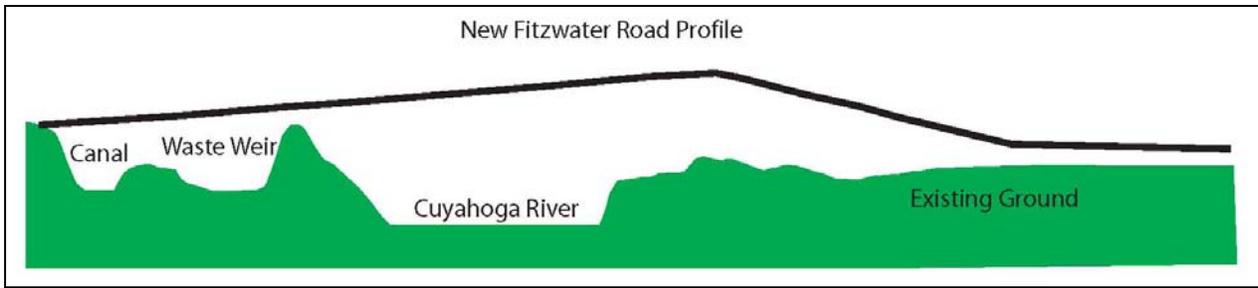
The profile of the new bridges and roadway would be higher than the existing roadway.
